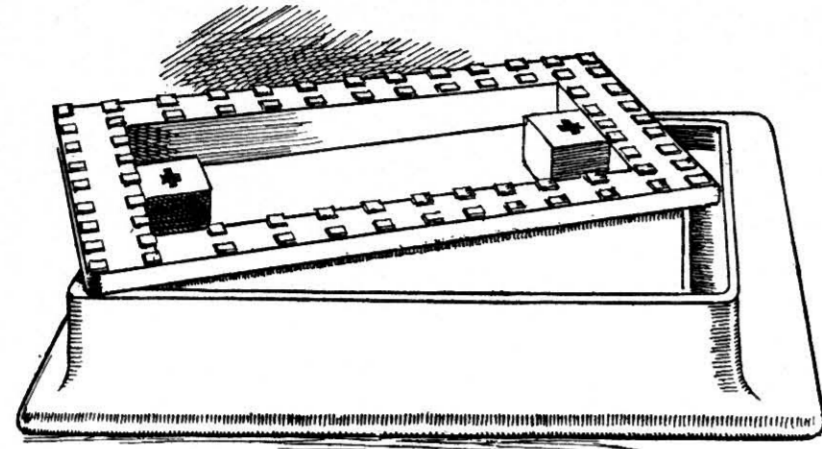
Adams's Air-tight Manhole-cover to receive Concrete Filling.¹
